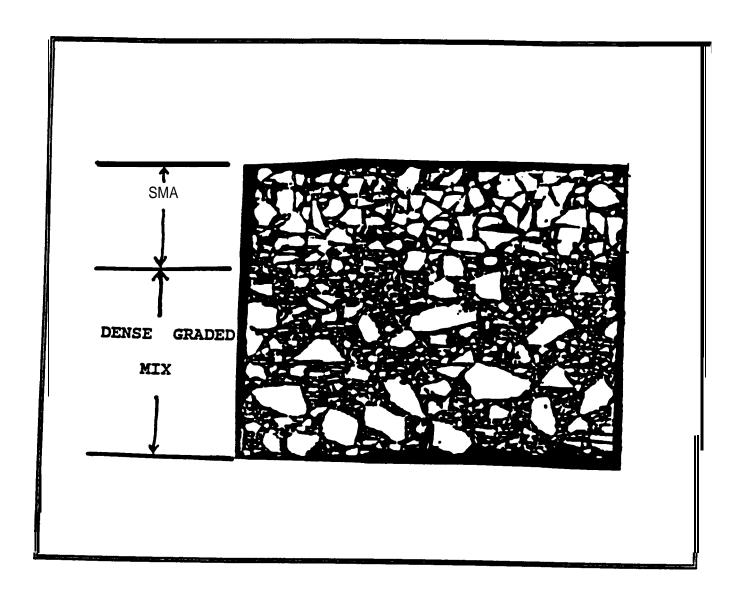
Pavement section with a Stone Matrix Asphalt (SMA) surface course over a conventional paving mix (Ref. 7).
